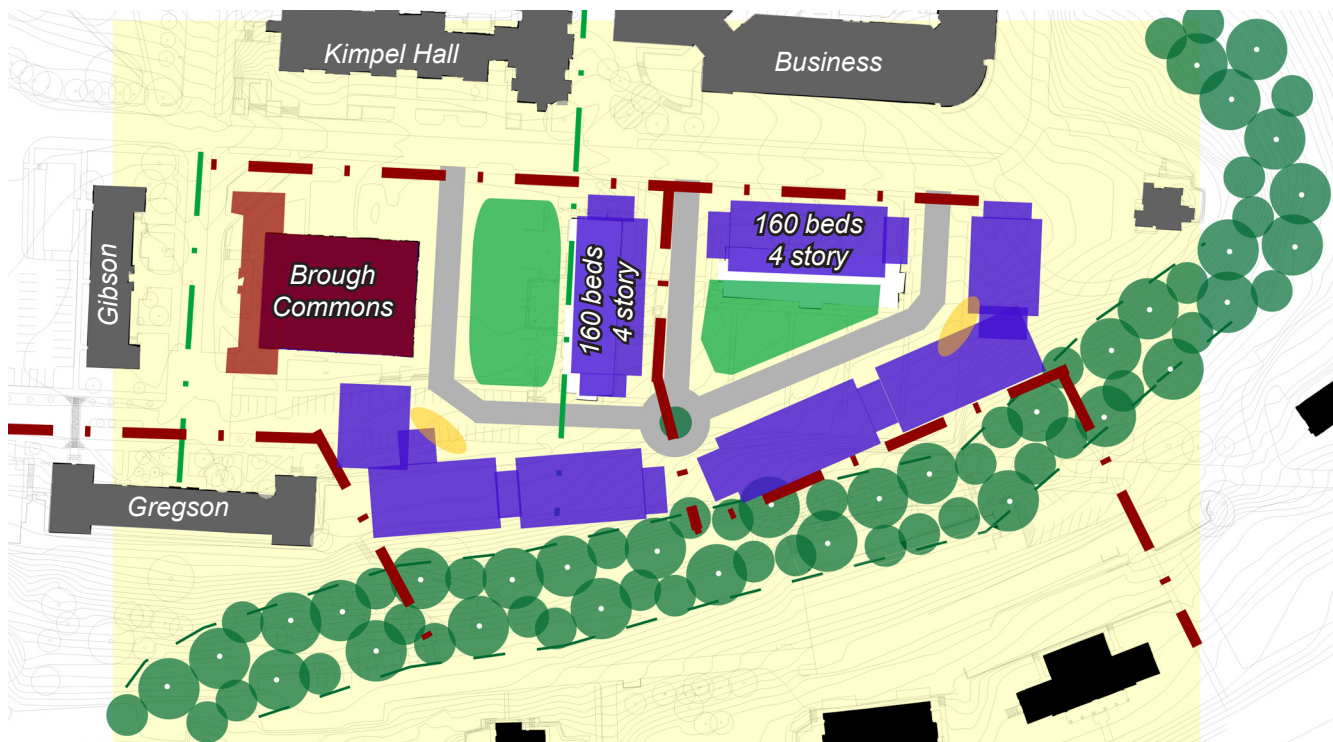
Concept for new Honors College housing on Mclloy Hill, keeping Brough Commons as a dining venue
